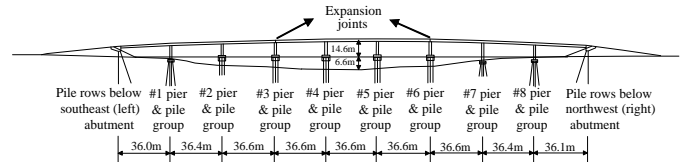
Schematic of bridge, pile foundations, and approach ramps (from Elgamal et al. 2008).
